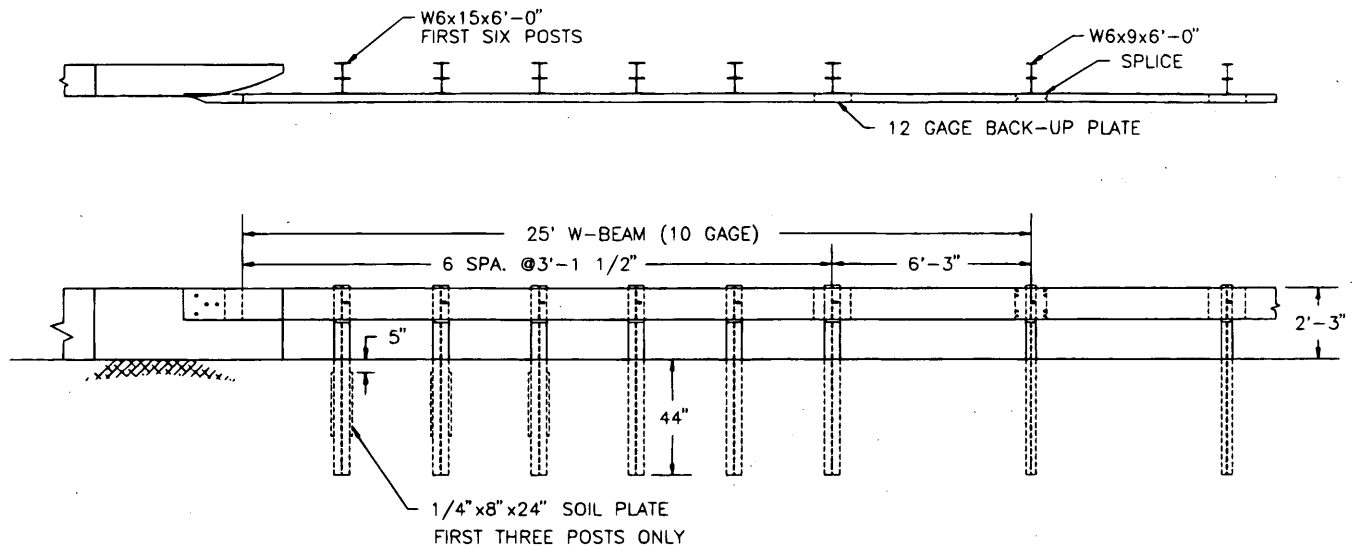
Standard TDOT steel post transition to vertical concrete parapet.
